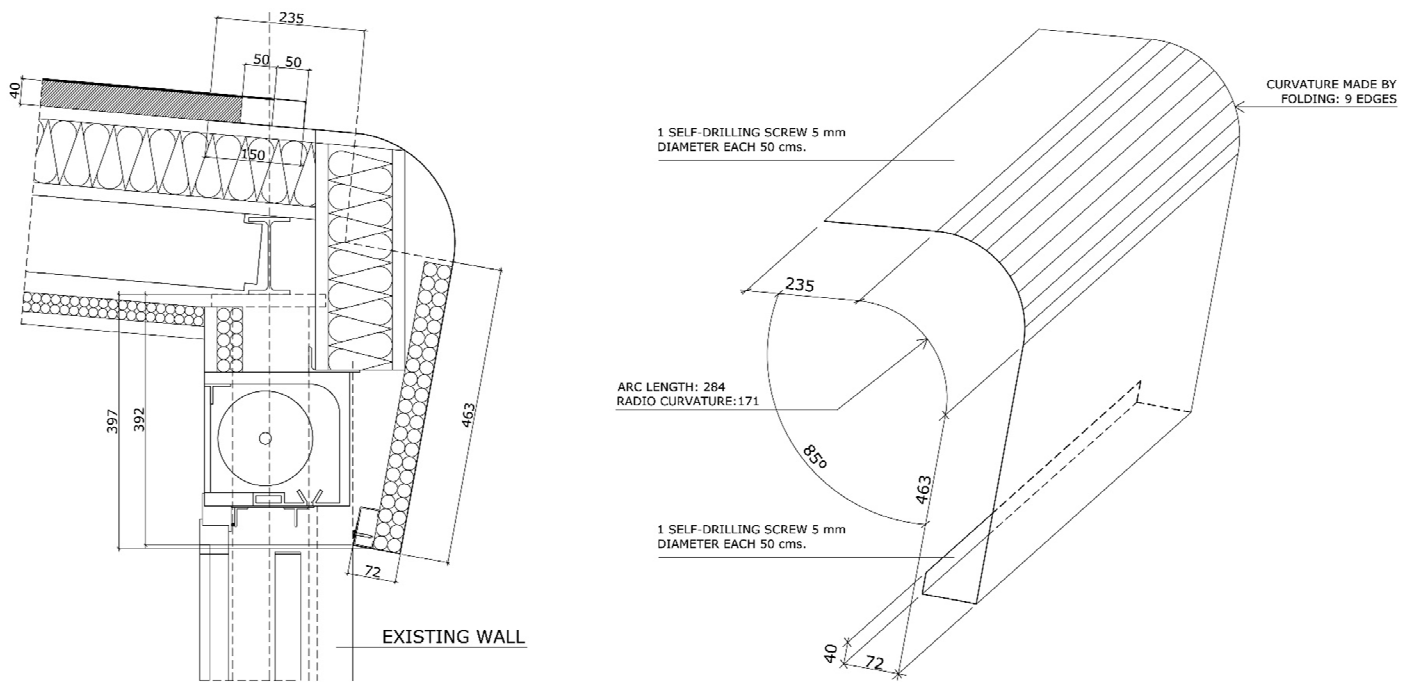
Detail. (1) Lacquered metal sheet thickness: 0.06 mm. Digital cut; (7) Profile W galvanized steel  $40 \times 40 \times 40$  mm; (8) Profile L galvanized steel  $40 \times 40$  mm. Riveted joint with W profile; (9) Guide fixing screw to cover panel; (10) Pine wood strip  $40 \times 40$  mm; (11) Lightweight insulating filler between guides. Thickness 40 mm; (12) Terno chip slab panel; (13) Elastic sealing of the joints between sheets; (14) Lacquered sheet metal part. Thickness: 0.06 mm. For termination at the factory edge, sealed with the base plate.
